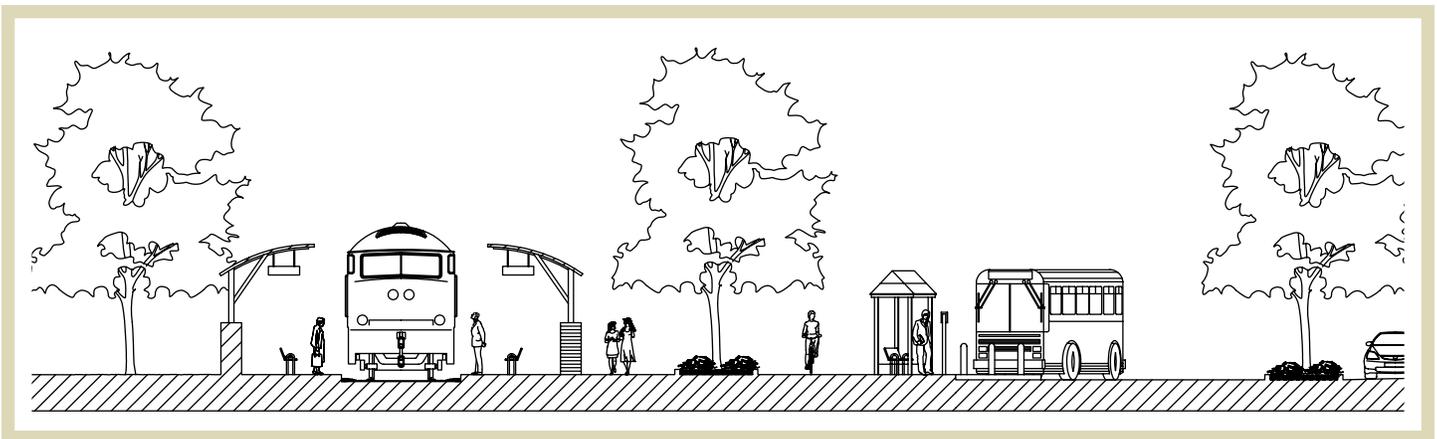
| Section showing at-grade tracks and single platform connecting both modes of transit.
